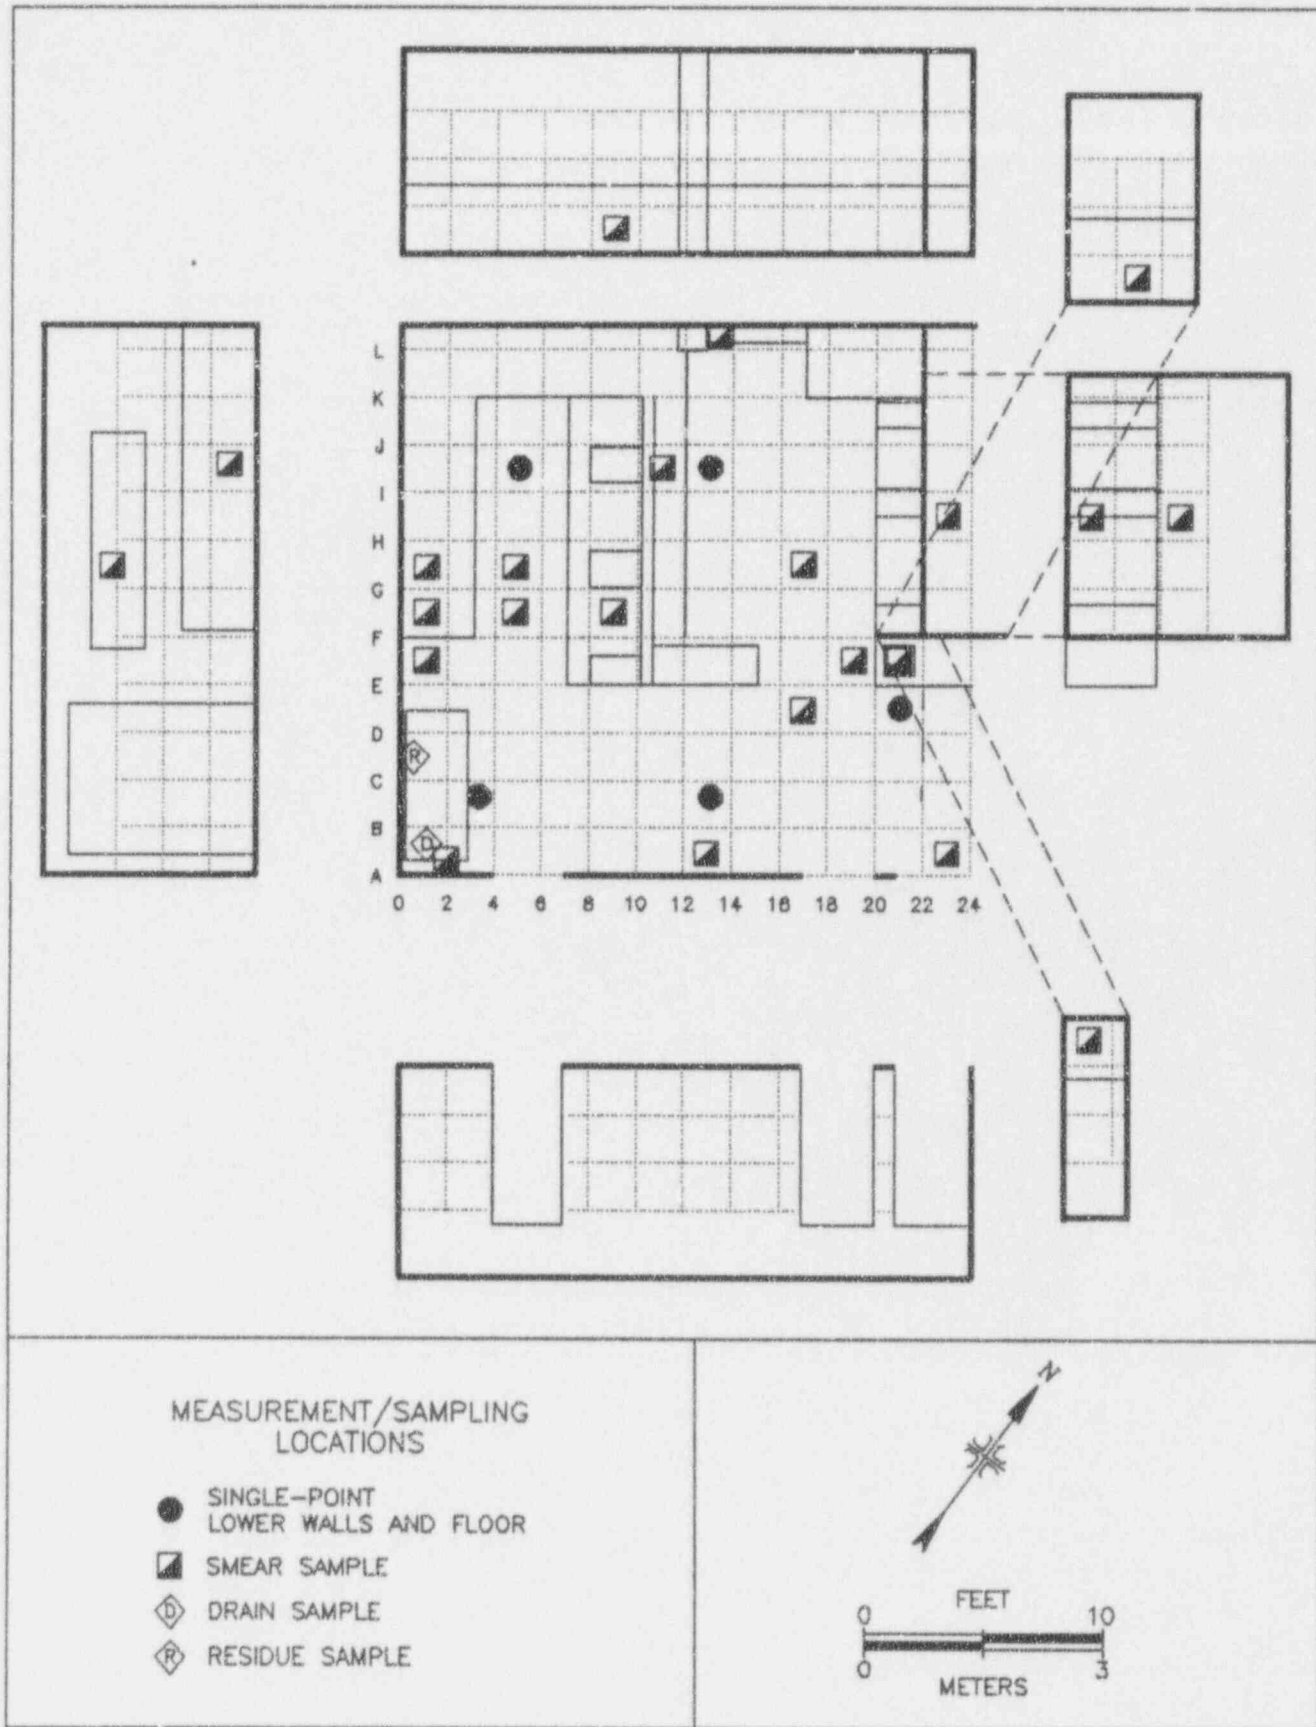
Building 1, Room 161 – Measurement and Sampling Locations
